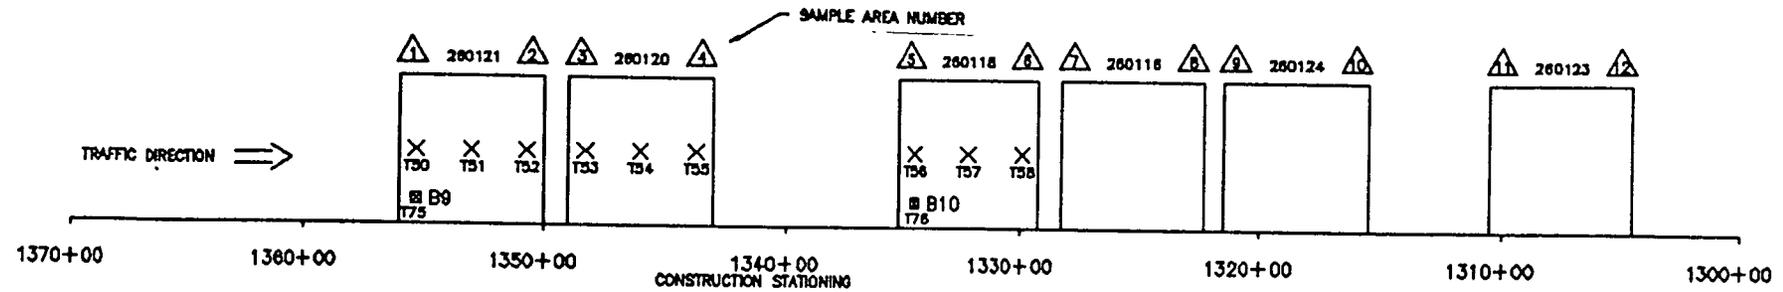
OVERVIEW OF SAMPLING AND FIELD TESTING PLAN FOR SUBGRADE (CONTROL SECTION) AND EMBANKMENT (SHRP SECTIONS)
